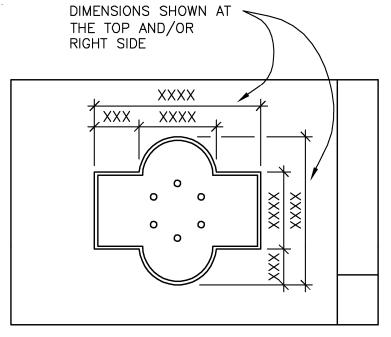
Dimensioned floor plan, exterior dimensions.
